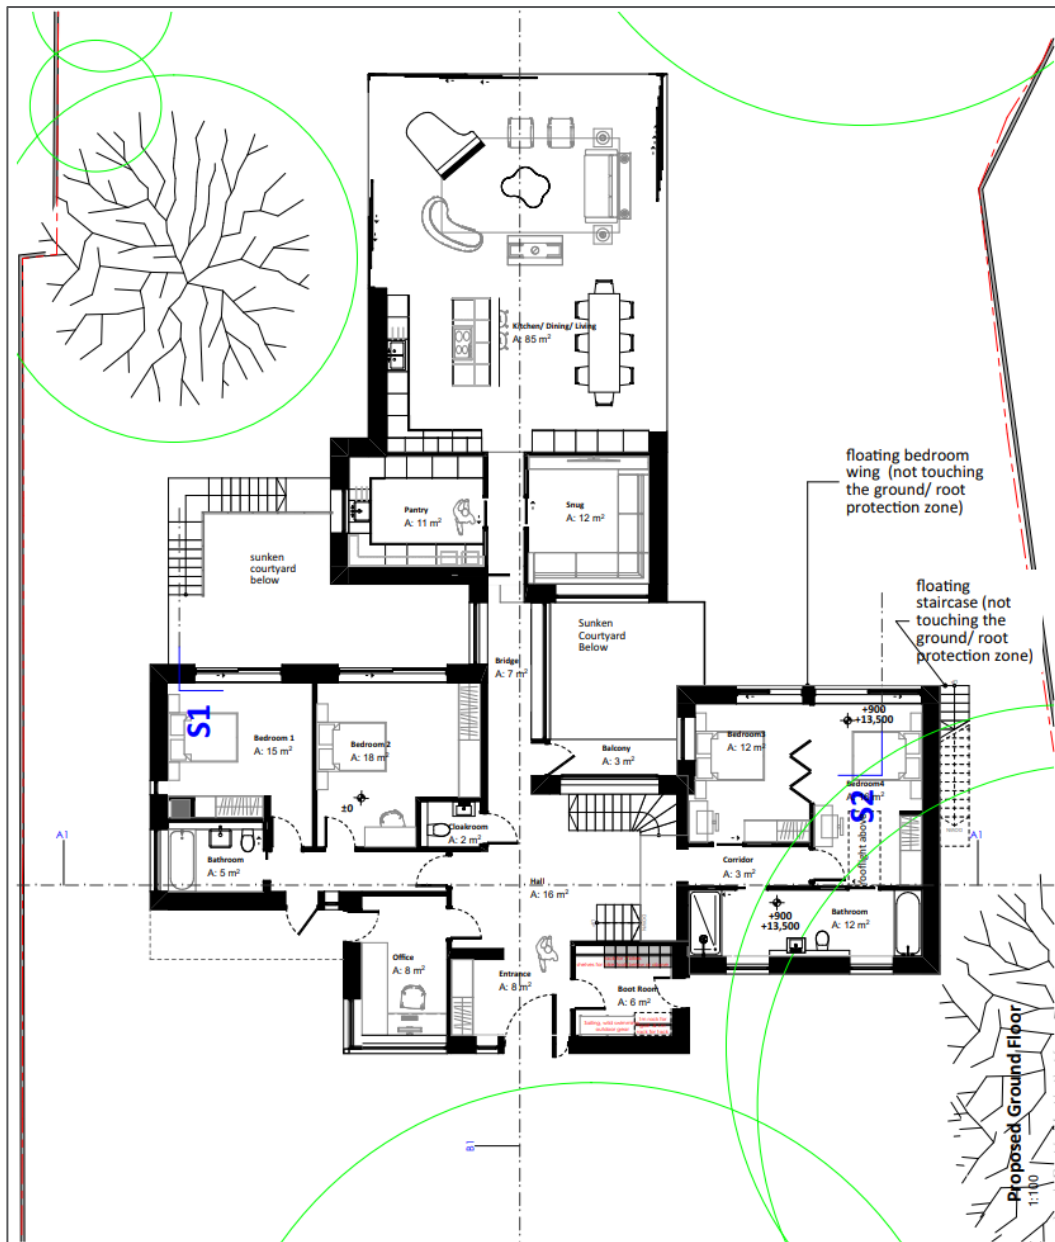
Proposed Ground Floor Layout - Holland Green (September 2024)
